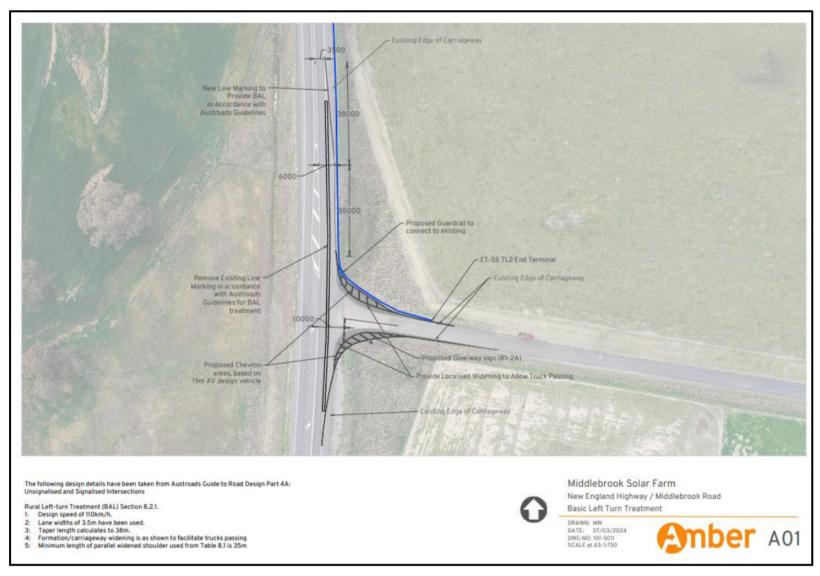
| Proposed upgrades at the intersection of the New England Highway and Middlebrook Road
